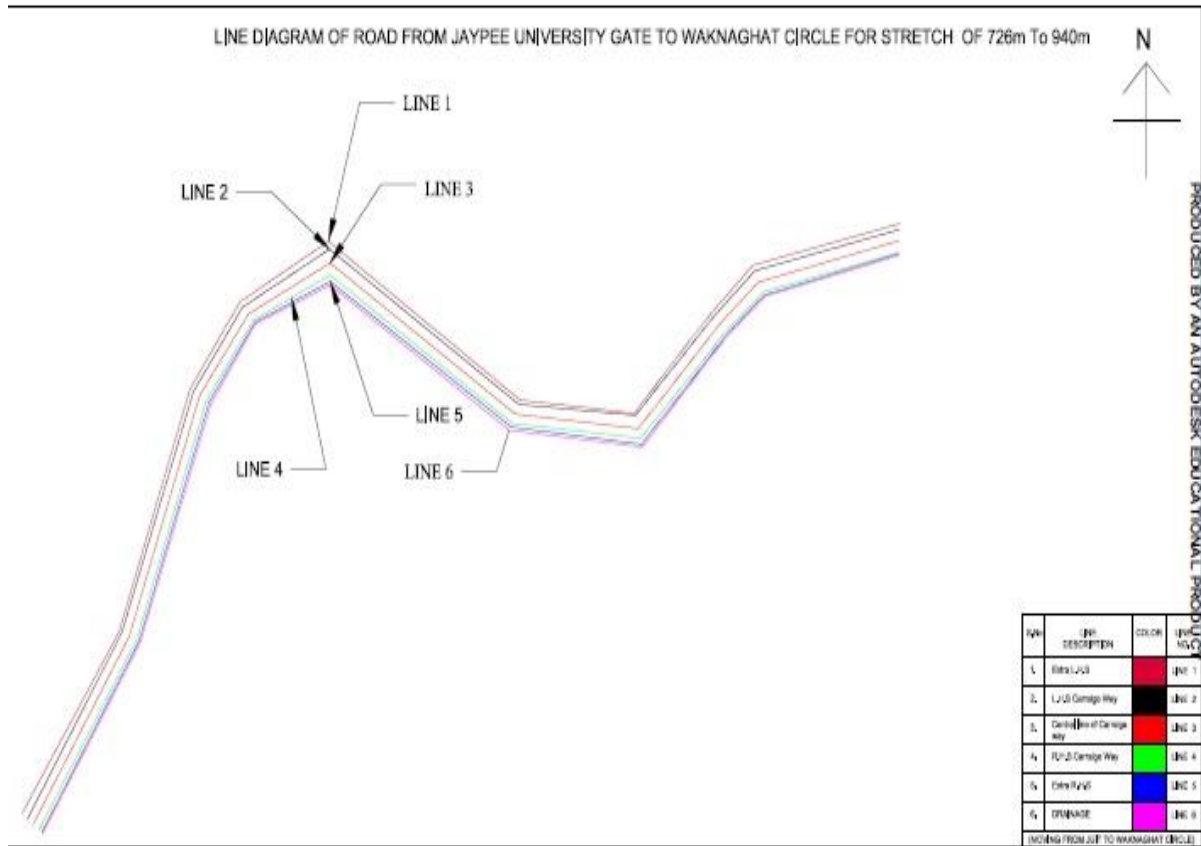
Auto cad drawing for road stretch from 726m to 940m
